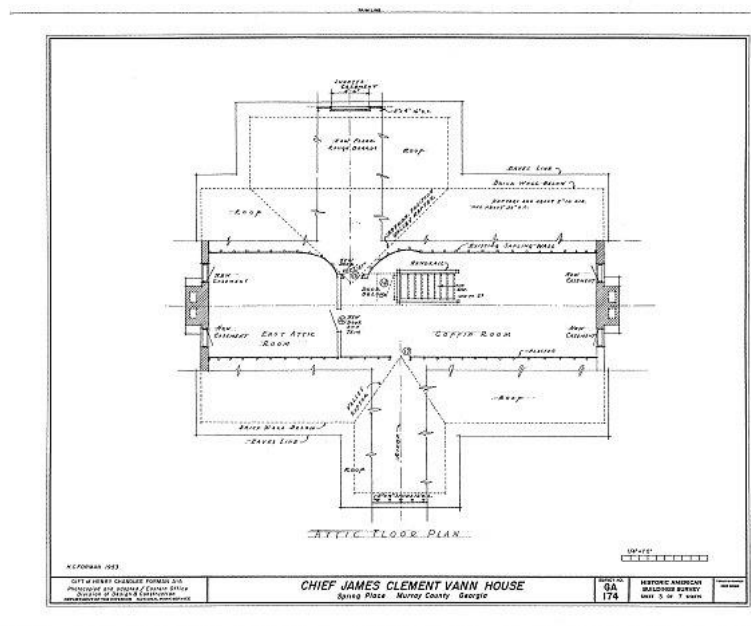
Chief Vann House third floor architectural floor plan that illustrates the boys room at the north end of the house and the girls room to the south. Also featured are the later additions of attic space to the east and west of the central rooms. (HABS).
